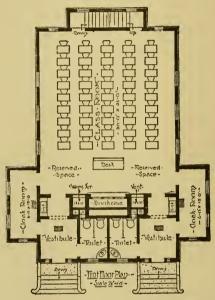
Plan of One-room Schoolhouse. With Fig. 14.
